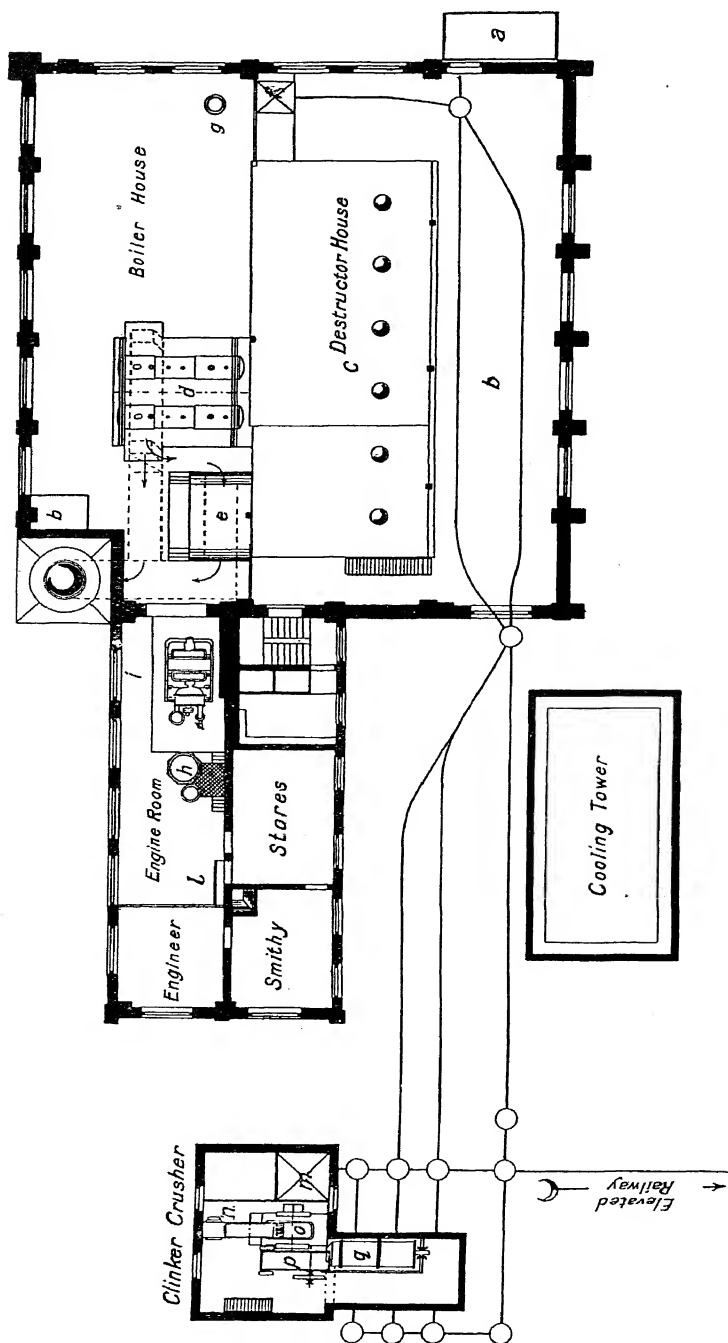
Dörr Destructor, Wiesbaden. Plan.
